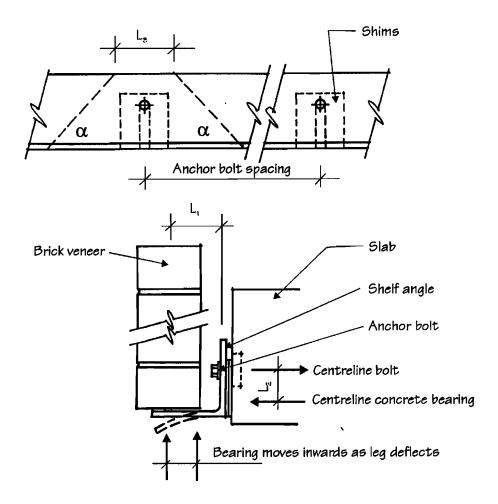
6 SHELF ANGLE AND ANCHOR BOLT DESIGN
